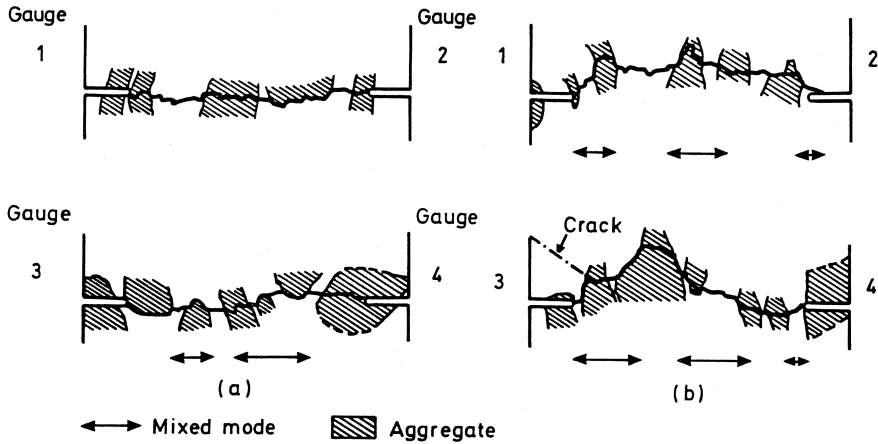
Reconstructed crack profiles. (a) specimen 7510_2, (b) specimen 14010_1.
